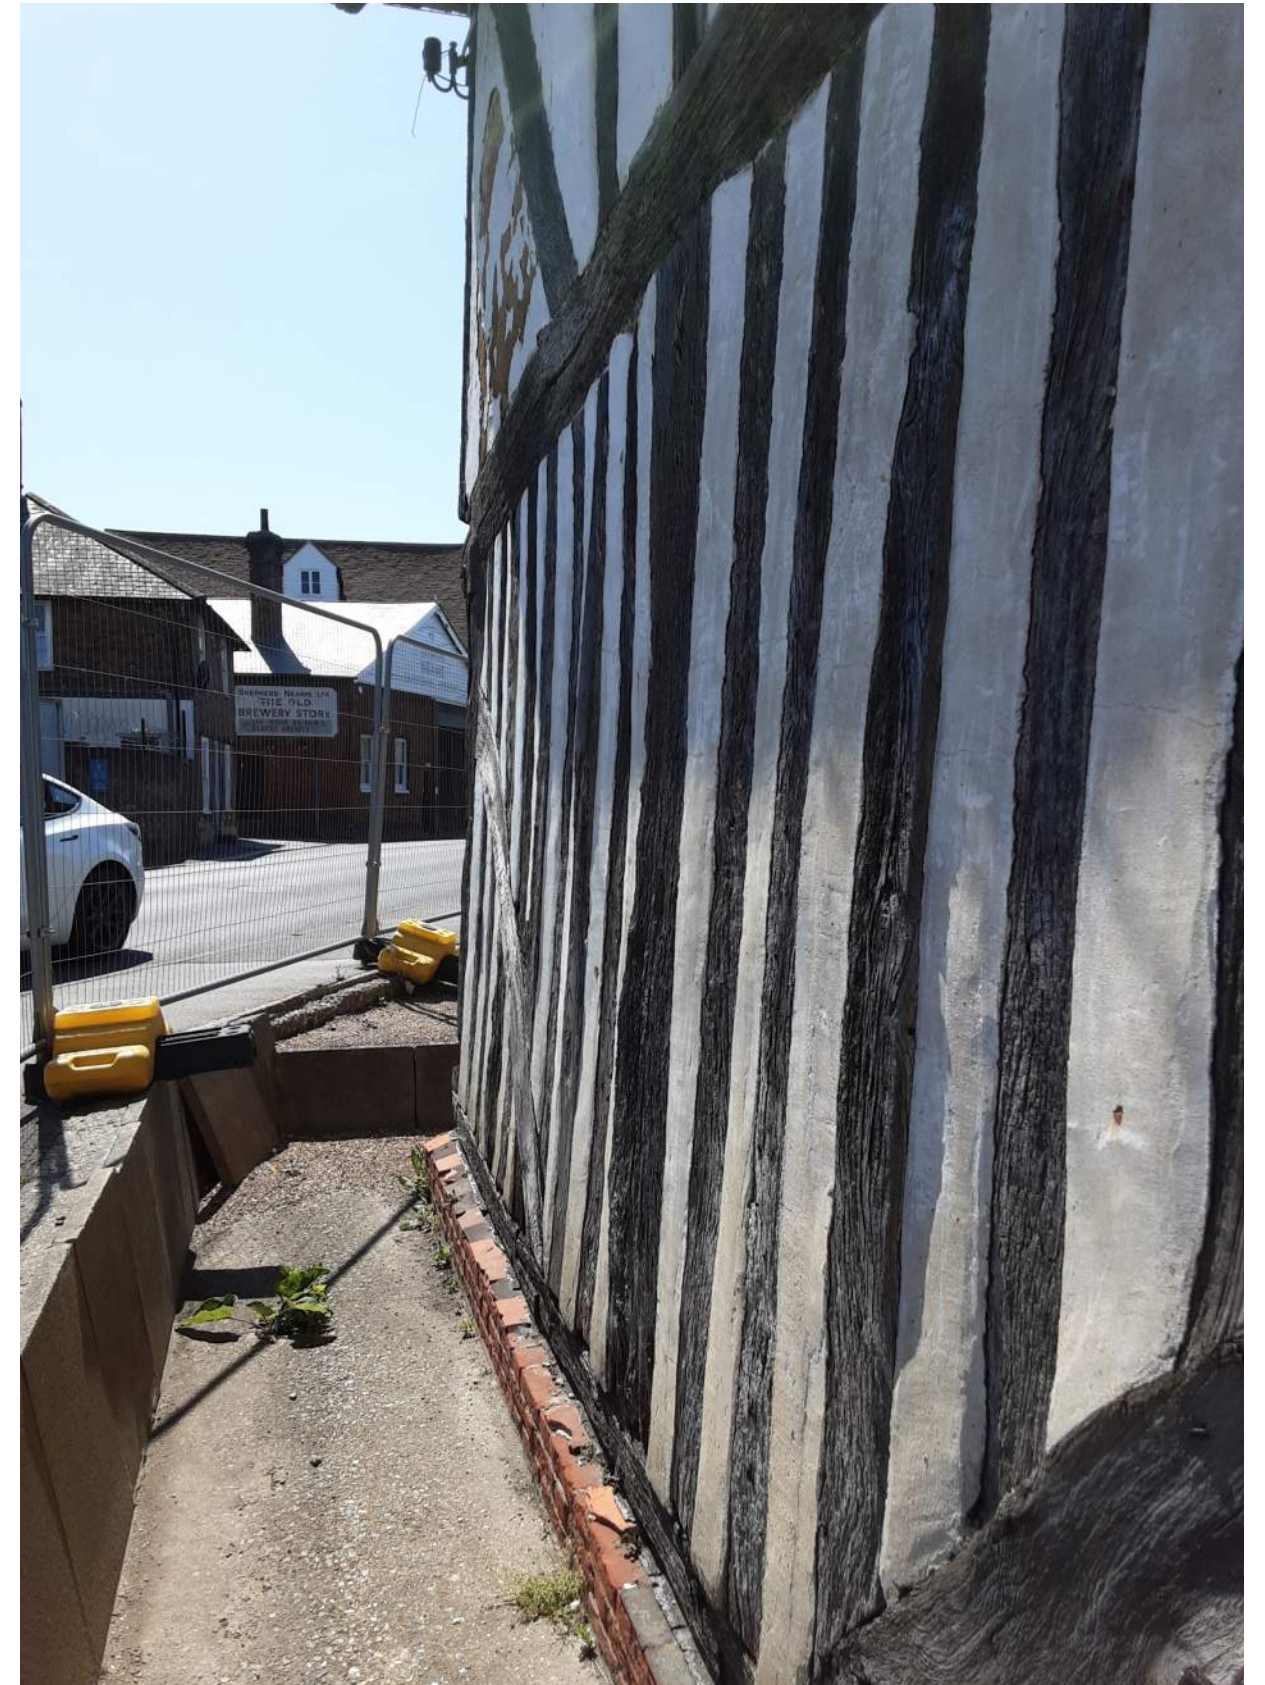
Sole plates, brick dwarf wall and sunken channel adjacent to the building, illustrating the relationship between ground levels and the lower timber frame.
